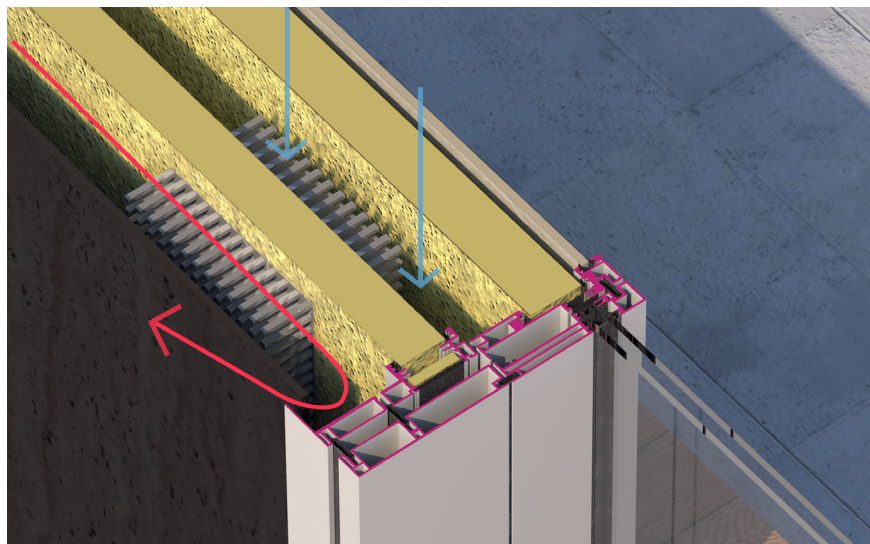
Section 3- Horizontal connection of TE facade with a glazed facade and air movements in summer
